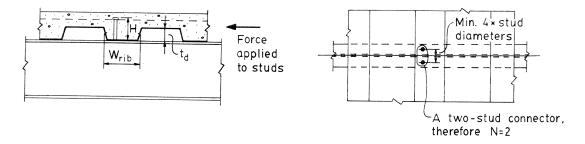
Multiple Stud Application in a Wide-Rib Profile Deck ($W_{rib}/t_d \ge 2$)
